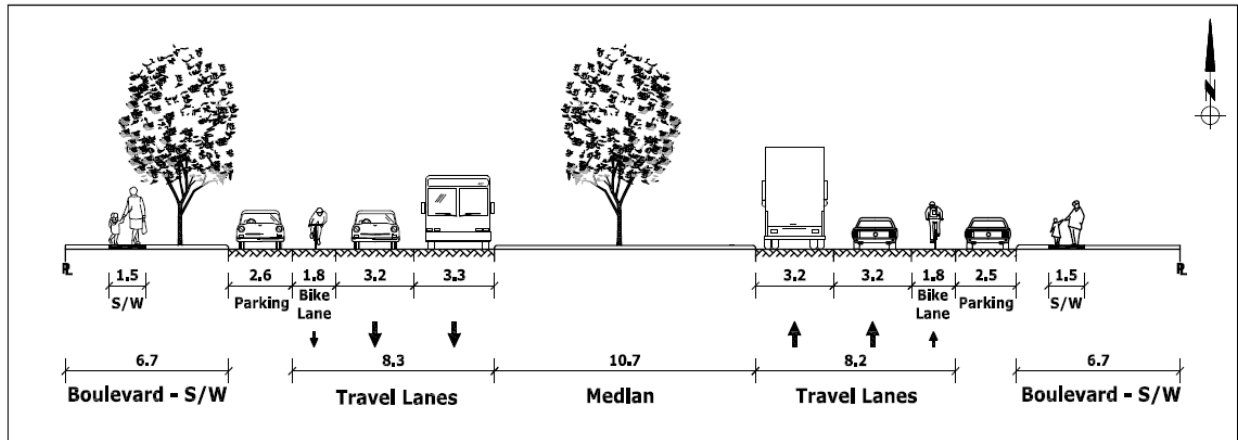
SW Marine to 49<sup>th</sup> Avenue - Recommended Typical Configuration
